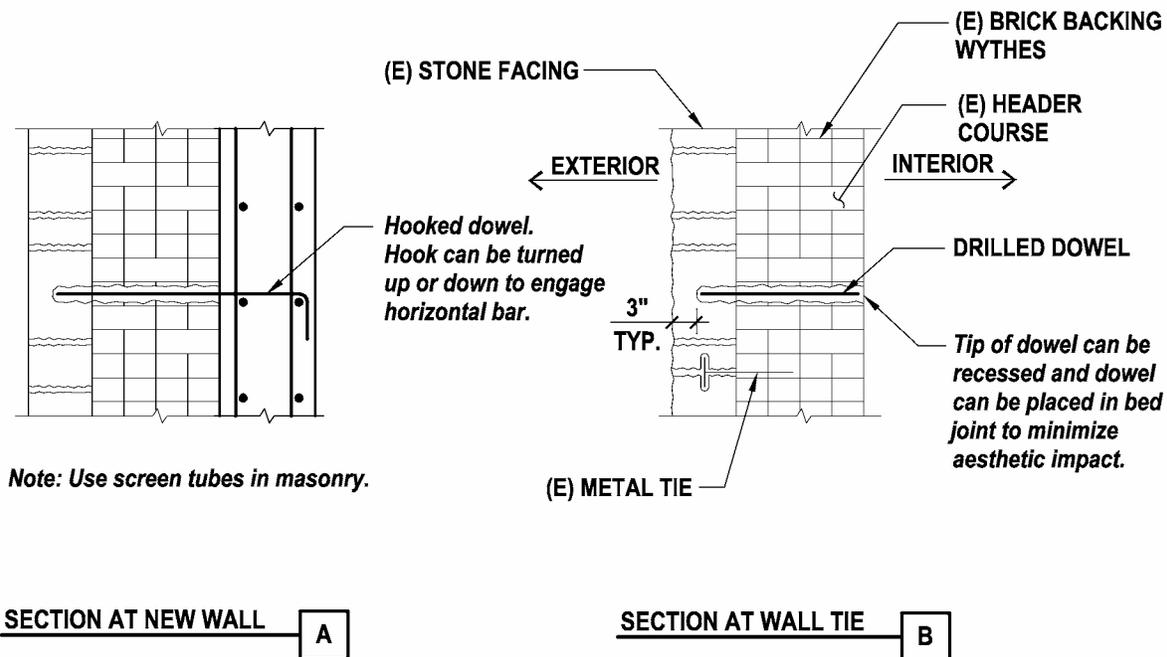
Veneer Ties for Stone Masonry Facing
